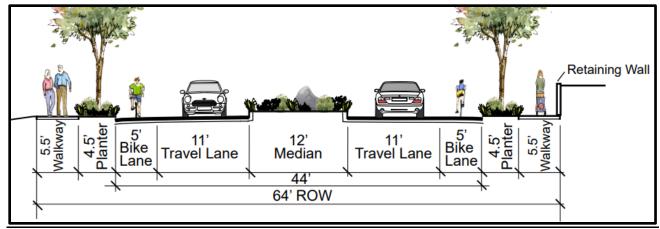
2009 Downtown Design Plan State Route 1 streetscape cross section south of Ocean Drive.
